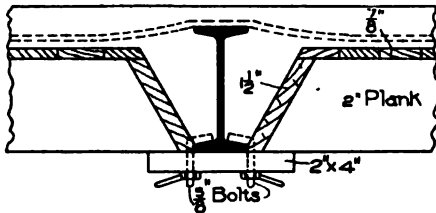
Form for Reinforced Concrete Slab between I-beams.
